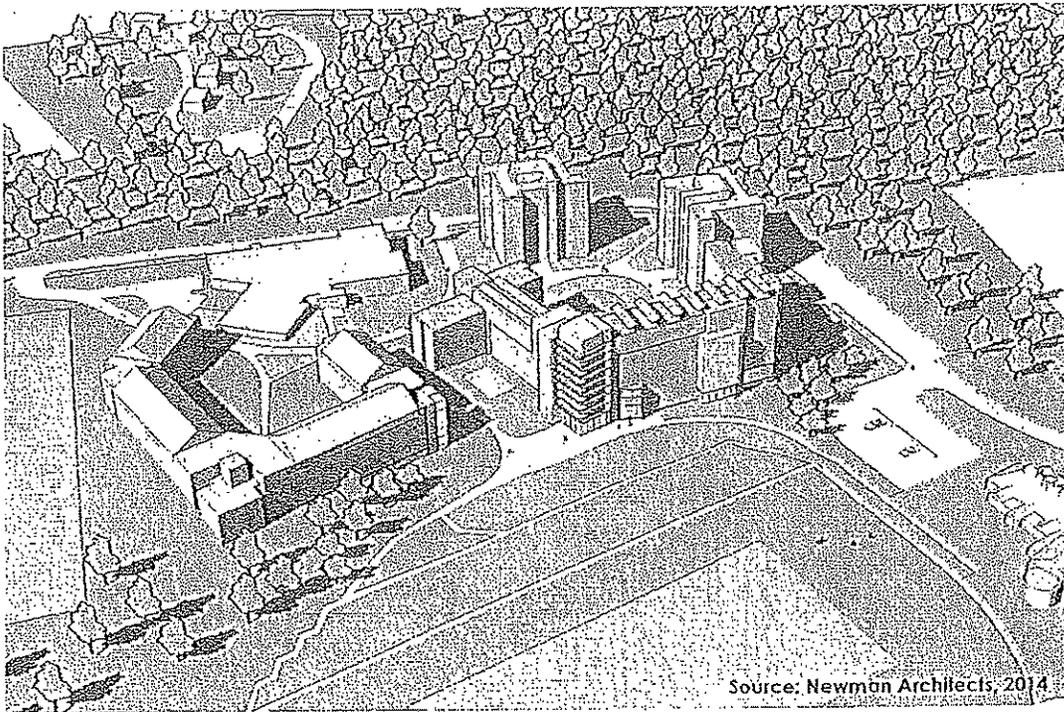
Proposed STEM Residence Hall Architectural Rendering Facing West
